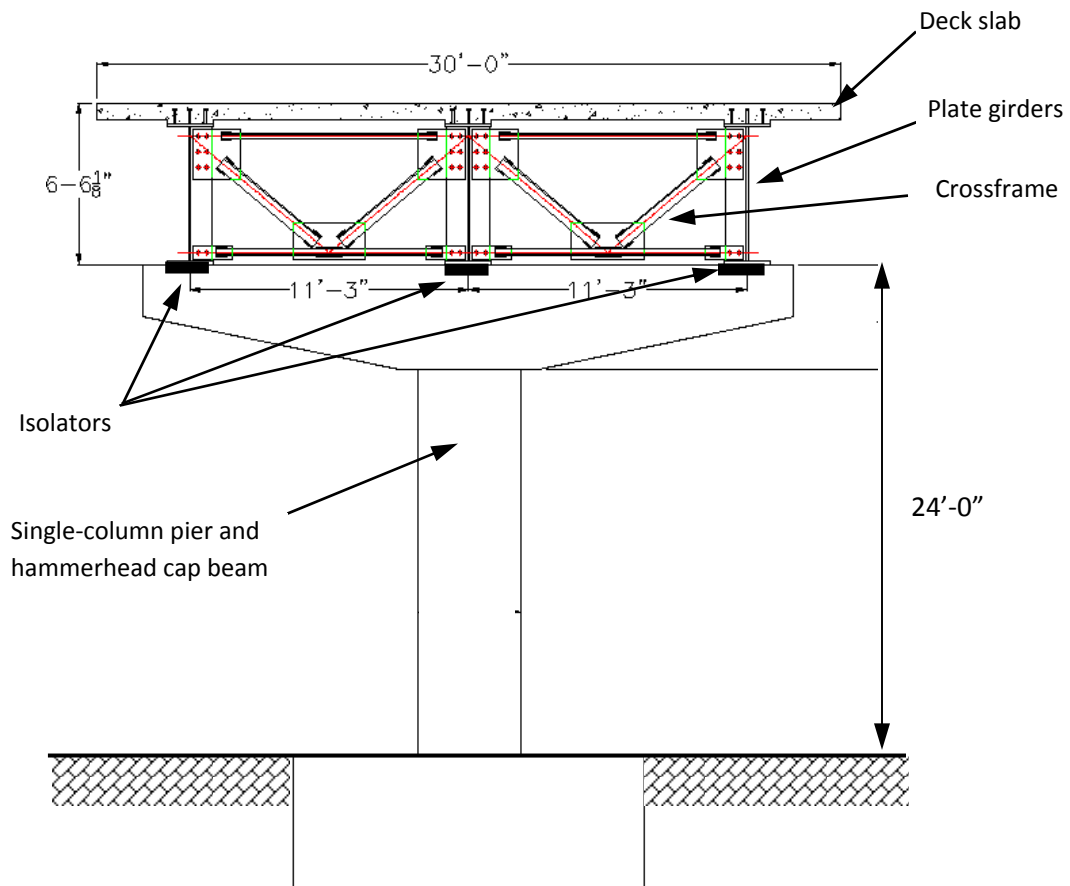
Typical Section of Superstructure and Elevation at Pier of Benchmark Bridge No. 2.
